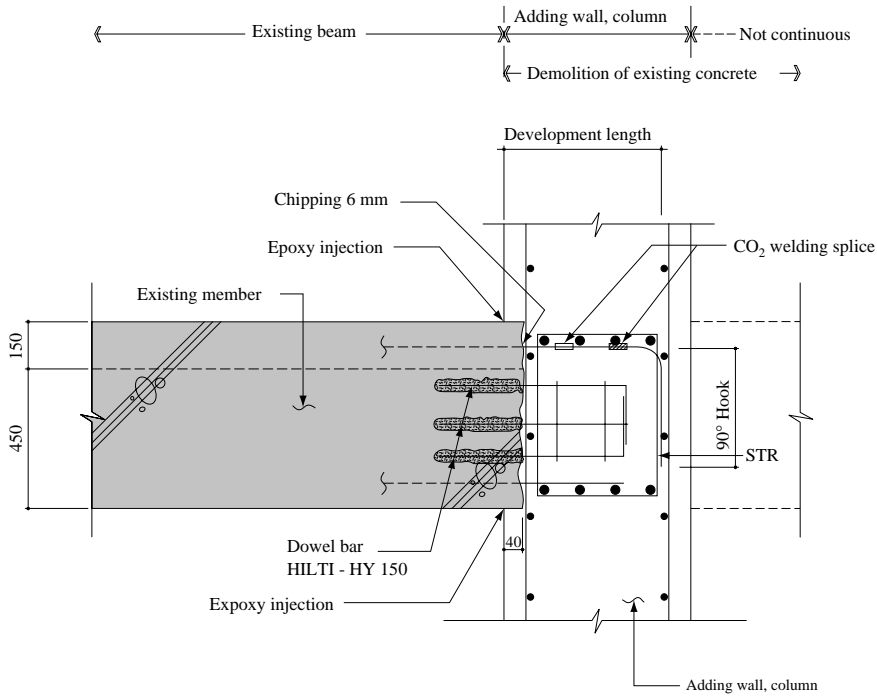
Joint detail between existing beam and adding column (Units: mm)
